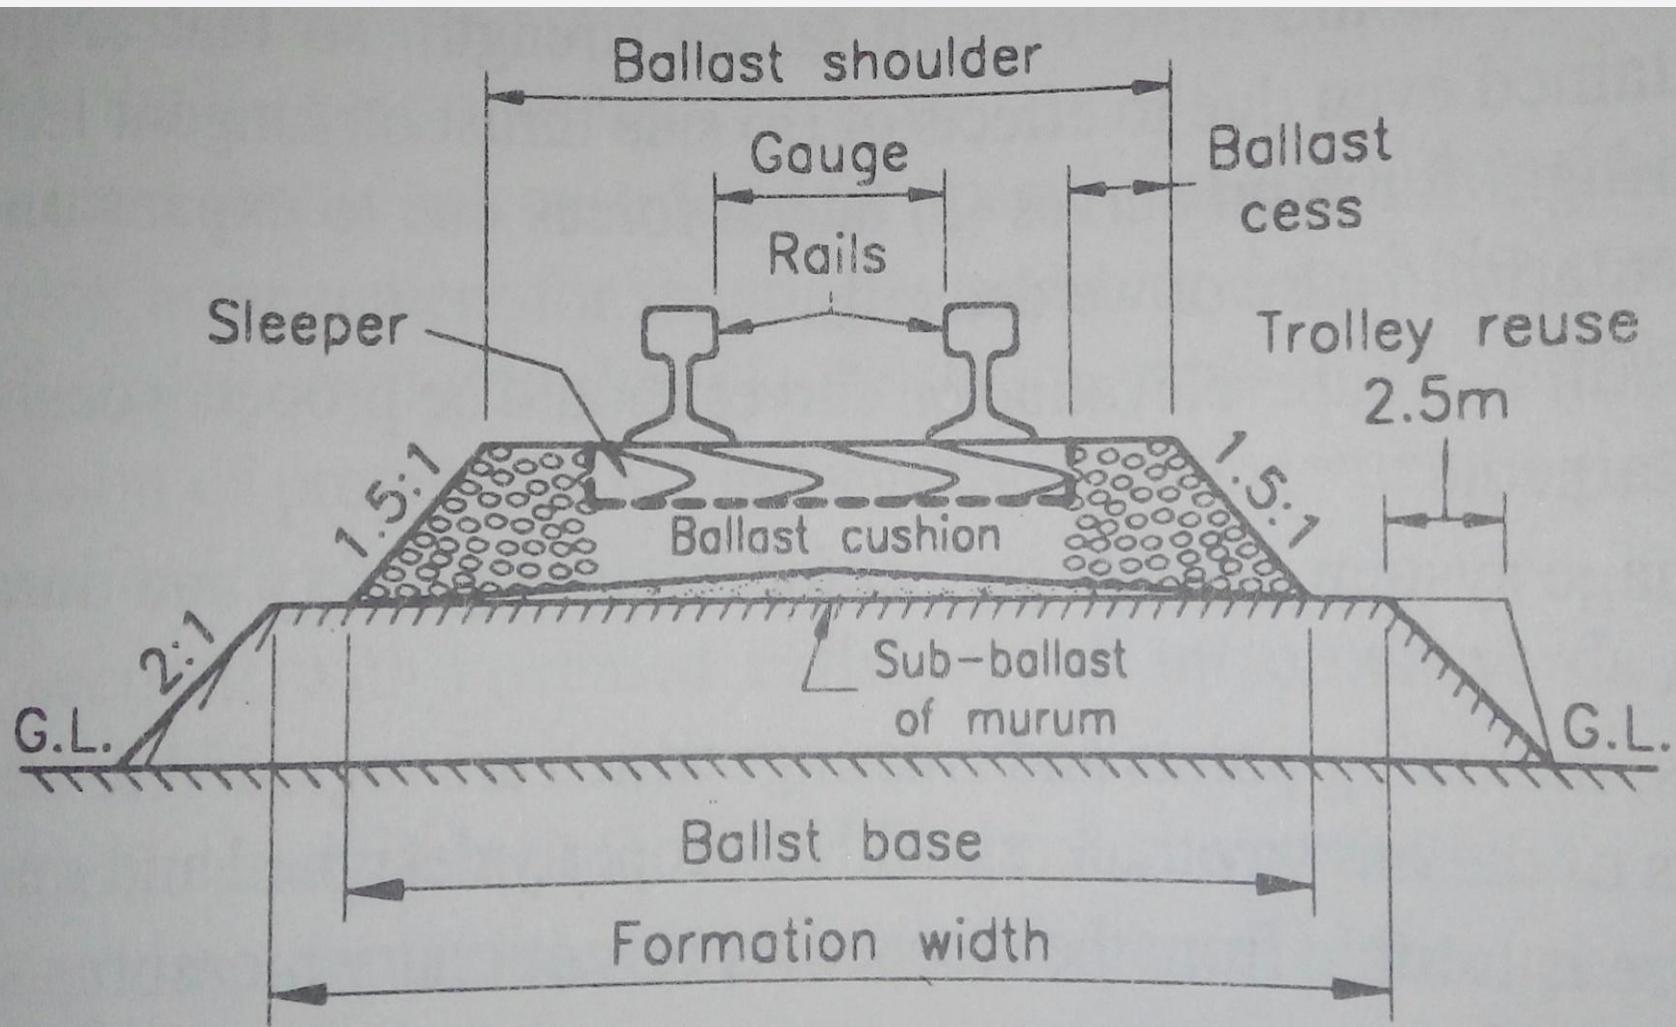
Typical Cross-section of a Permanent Way on Embankment.
